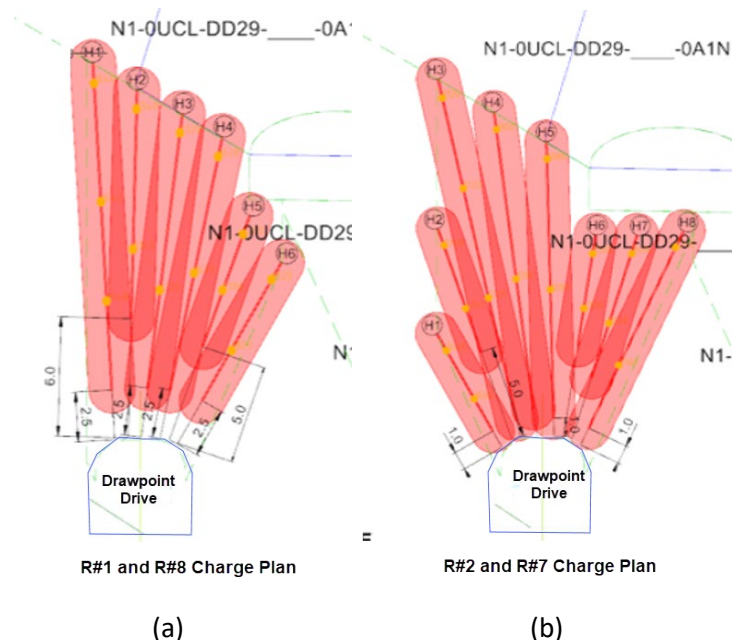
(a) R#1 and R#8 charge plan adjustment to protect the brow set at P0 drawbell; (b) R#2 and R#7 charge plan adjustment to protect the brow set at P0 drawbell
